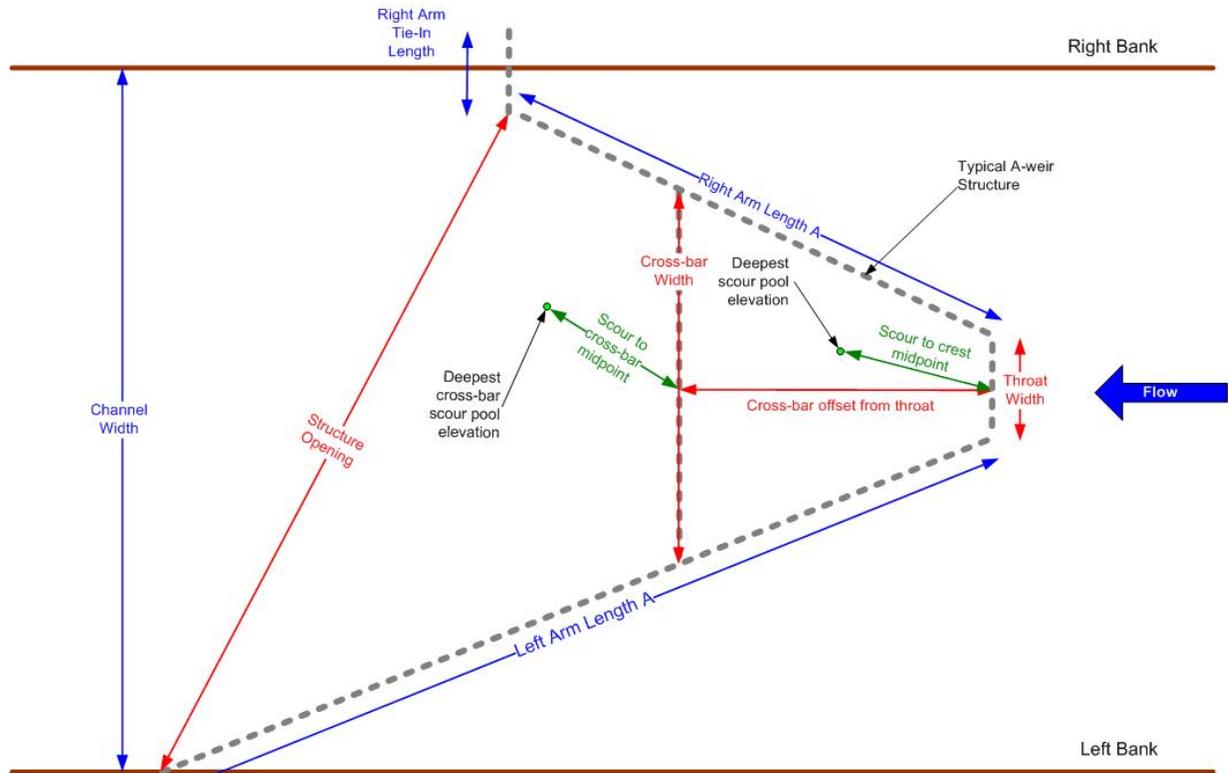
Plan view schematic of a typical A-weir river spanning rock structure.
